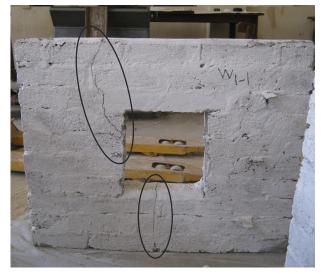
The crack pattern for tested wall specimen before rehabilitation
